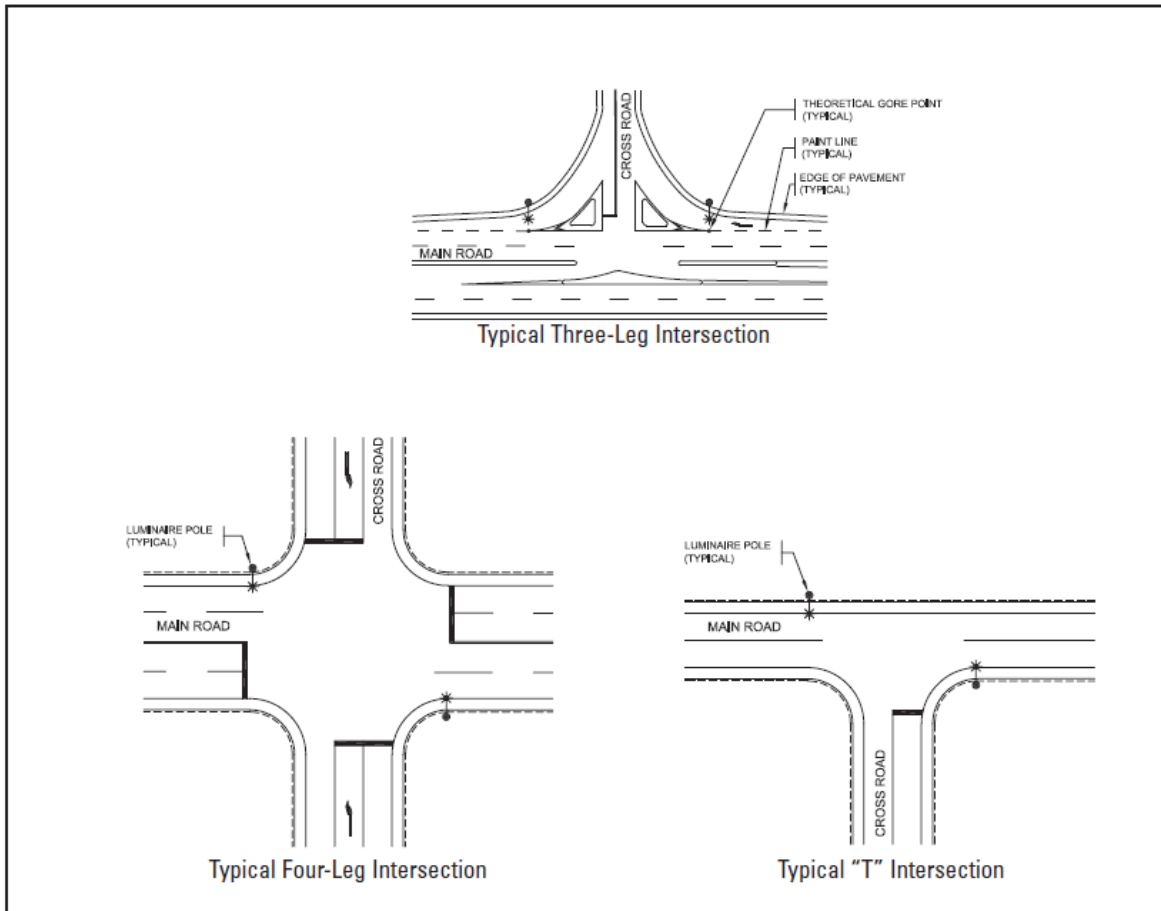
Typical Partial Intersection Lighting Pole Placement (Source: TAC Roadway Lighting Guide)
